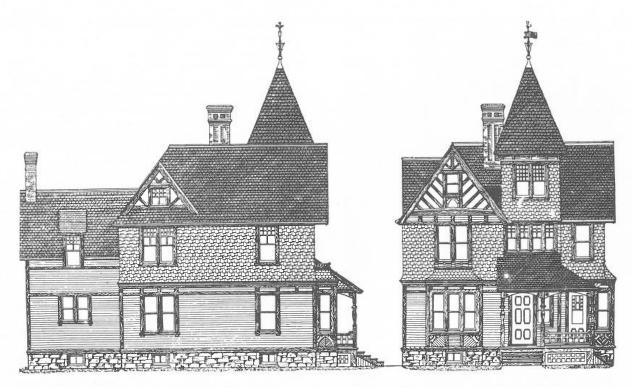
Front and Side Elevations, Palliser's Modern Eight-Room Cottage, with Tower.
